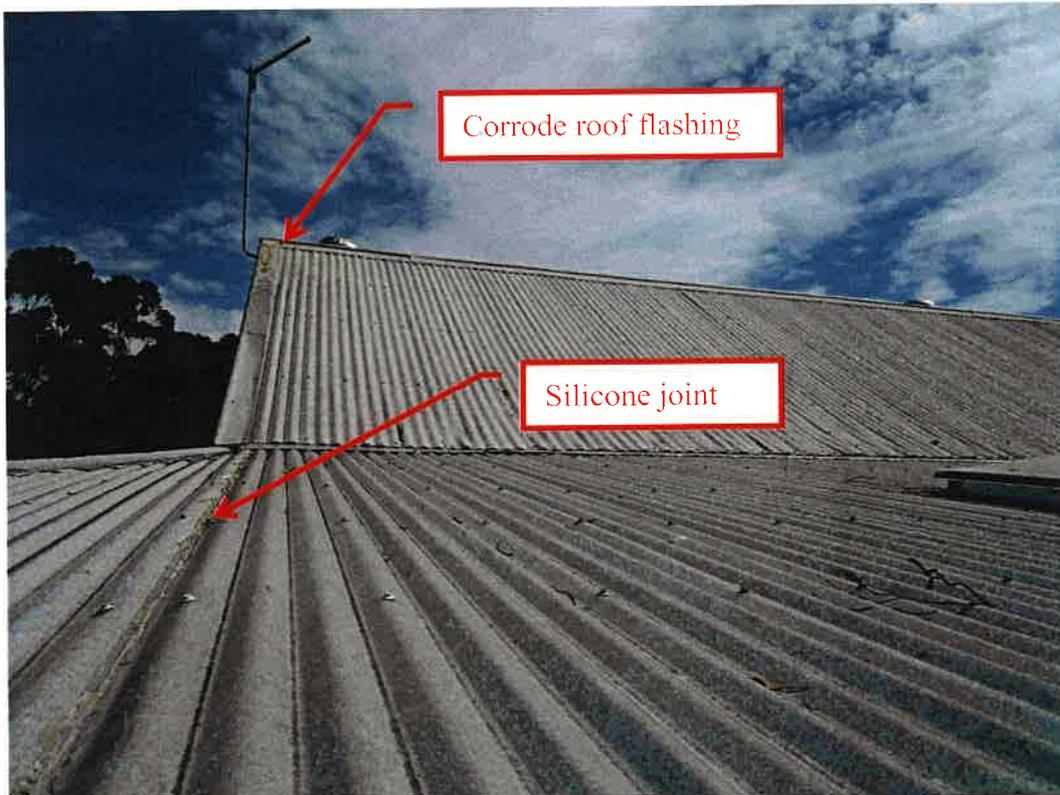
; North side roof. Silicane joint. Corroded roof flashing.
